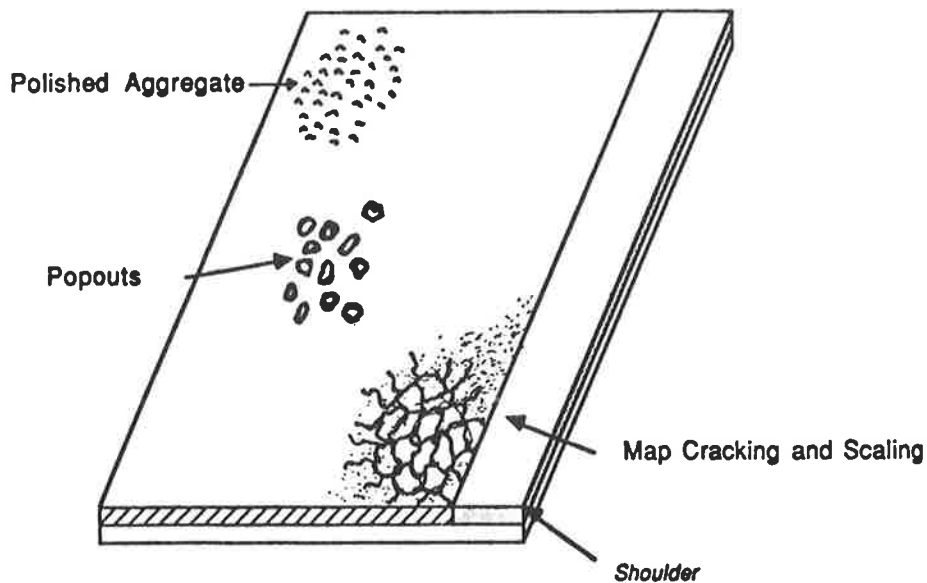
Surface defects of continuously reinforced concrete pavement
